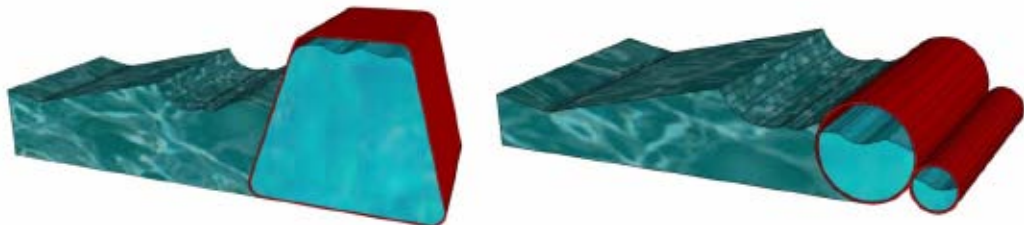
Sketch of the systems with a trapeze and circular cross-section
